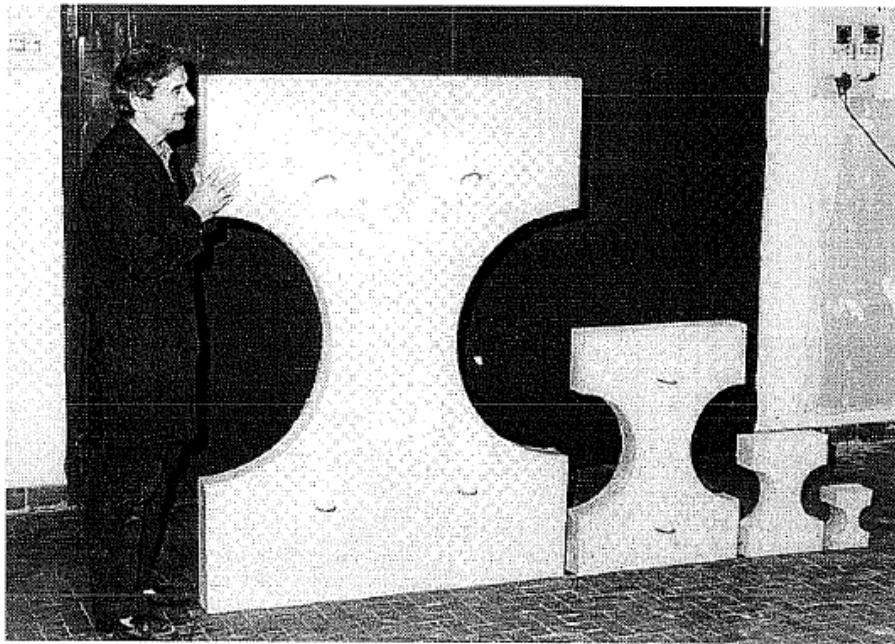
Dog-bone shaped concrete specimens tested by VanVliet&van Mier (2000)
